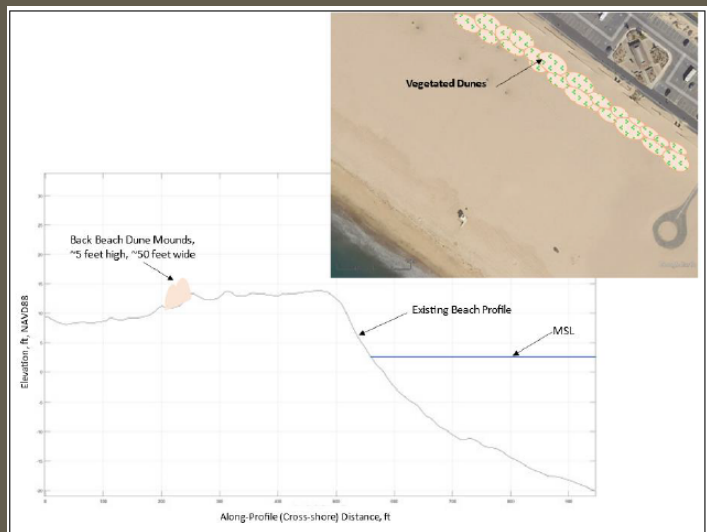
Backbeach Dunes Design Plan View and Cross Section
